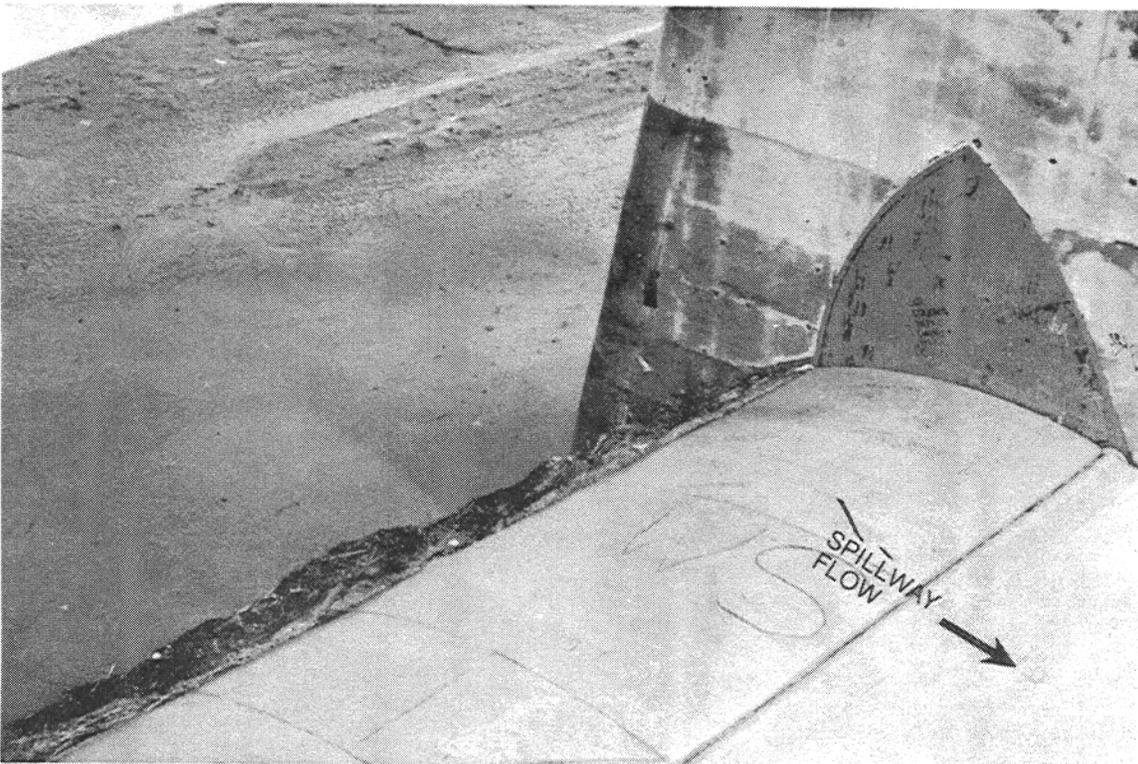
Spillway Gate in Lowered Position (view from spillway bridge, with reservoir to left).
